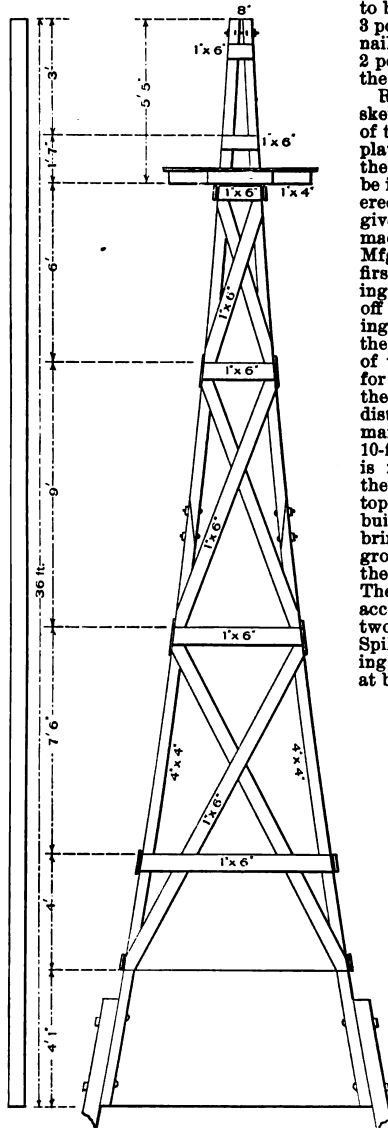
Elevation of 36-Foot Wind Mill Tower.
